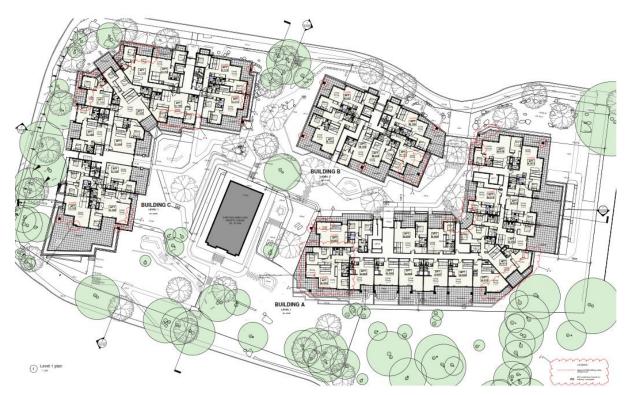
Pacific Lodge & Level 1 Floor Plan / Landscape Plan (Dwg No. A 2.03)
